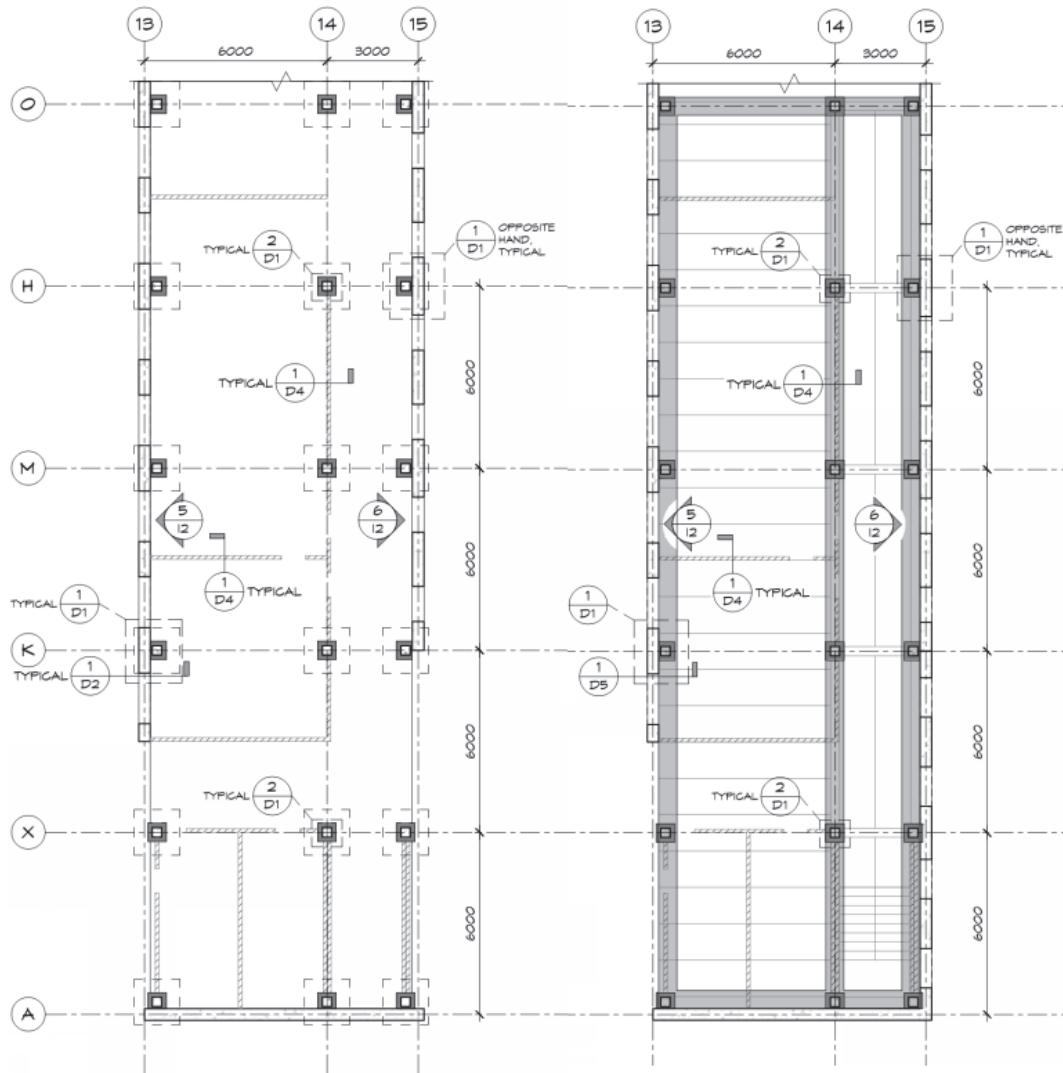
Plan showing columns and nonstructural walls with jacketing in PC Increment 2.
